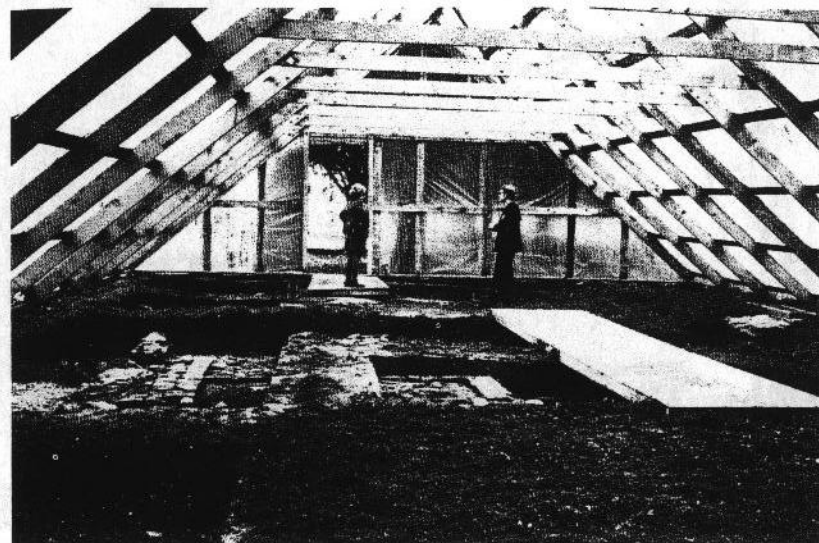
St. Mary's site, Maryland, U.S.A. Temporary roof of polythene and wooden framework over excavation.
